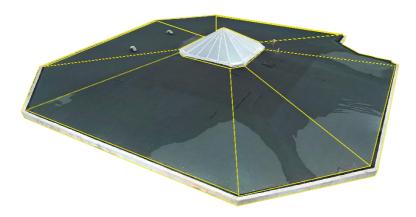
SOCIAL FACILITY ROOF TOP PV LAYOUT PLAN
